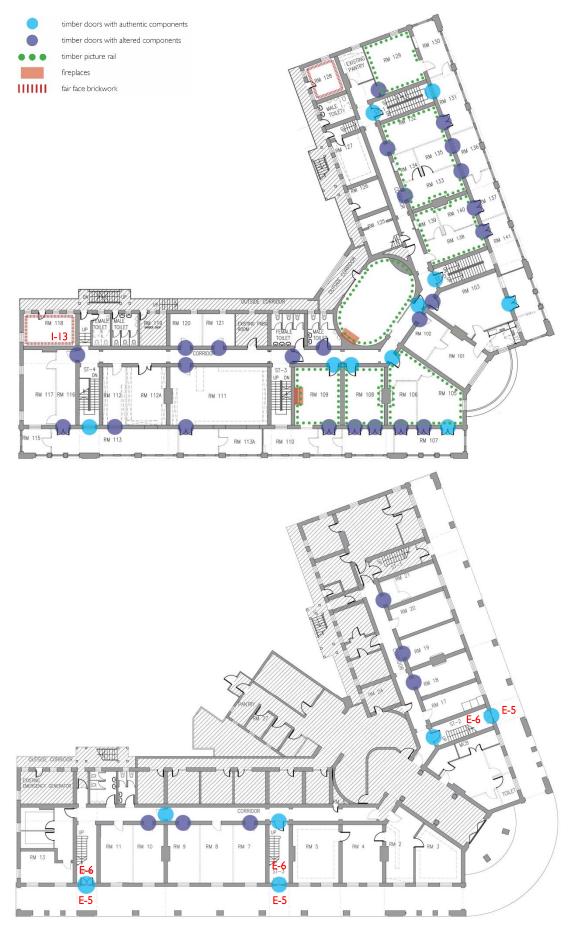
Timber doors with authentic components, timber doors with altered components, timber picture rail, fireplaces and fair face brickwork on G/F (lower) and 1/F (upper).
